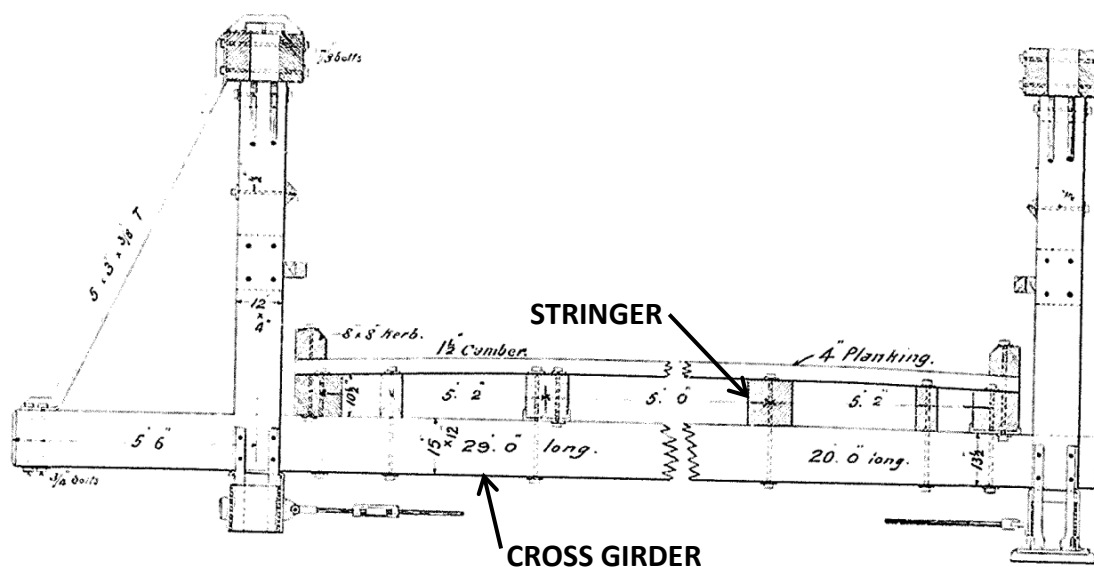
Original Drawings showing details for Cross Girders and Stringers in 70' de Burgh Truss
